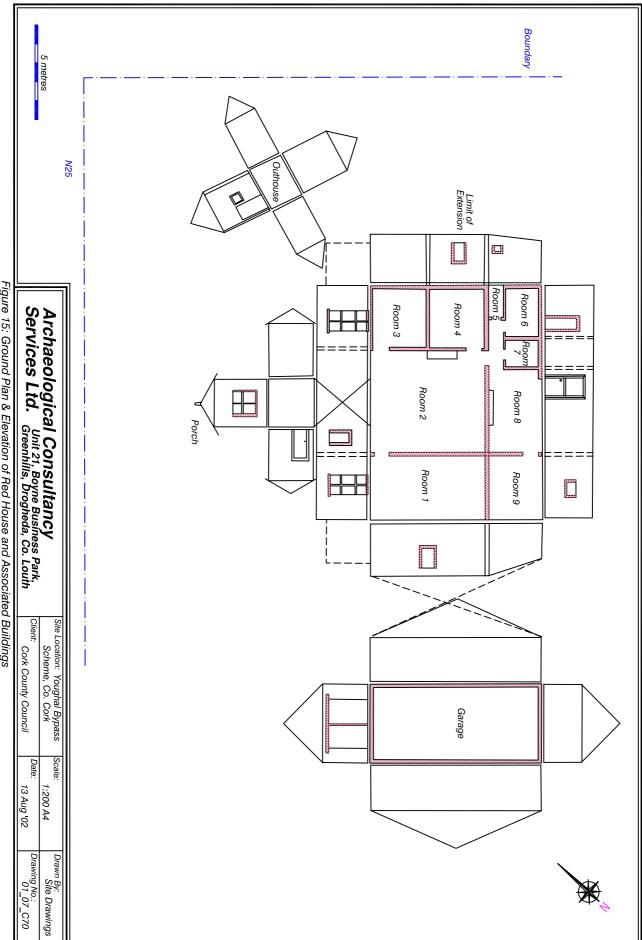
Ground Plan & Elevation of Red House and Associated Buildings
